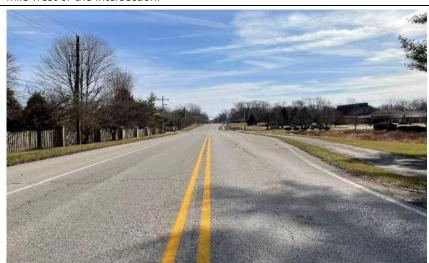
Looking east up 106th Street, approximately 0.16 mile west of the intersection.
